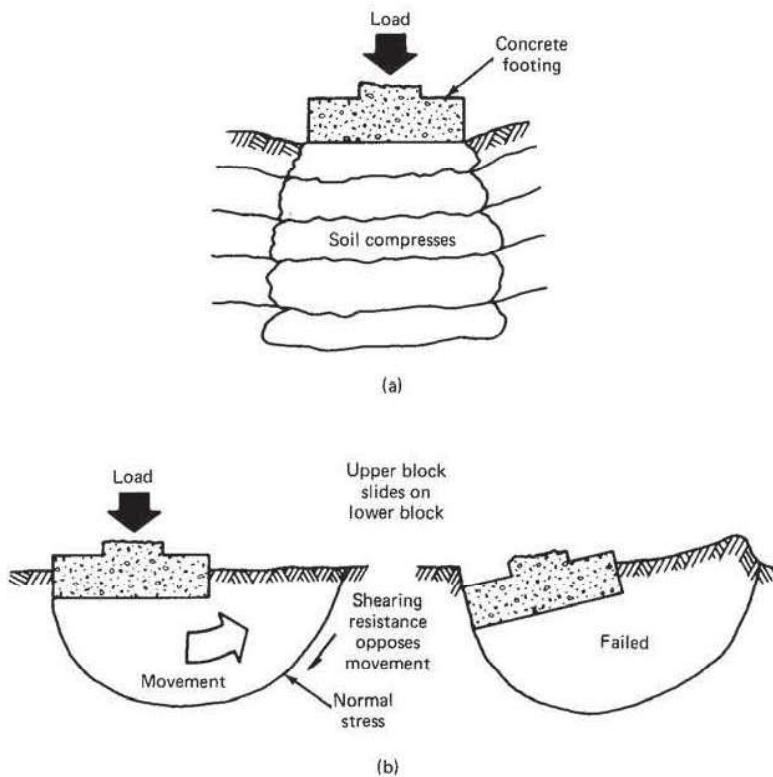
Behavior of a footing foundation: (a) settlement of footing and (b) bearing failure.
